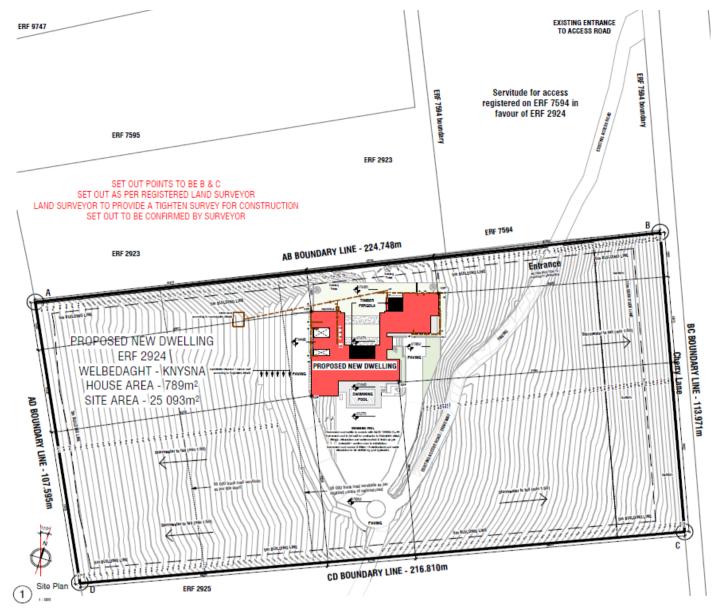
Revised site development plan with access road (Mathews + associate architects, 2024)
